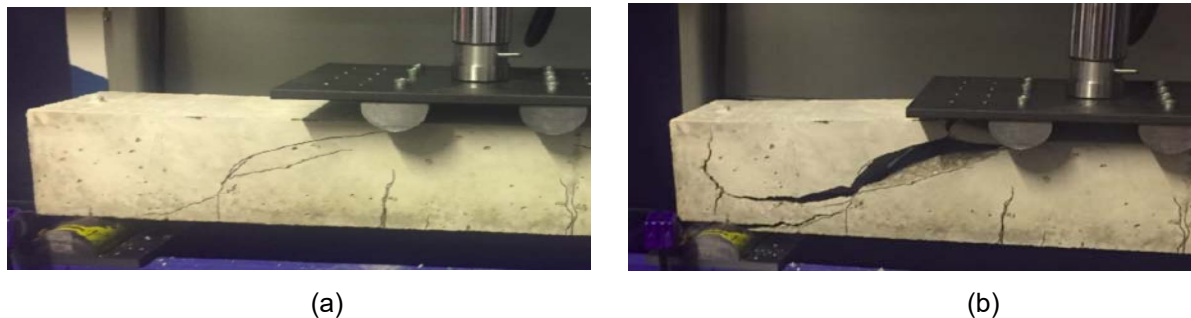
Failure patterns in a beam without stirrups with longitudinal 3-10M bars at the onset of shear cracking (a) and at failure (b).
